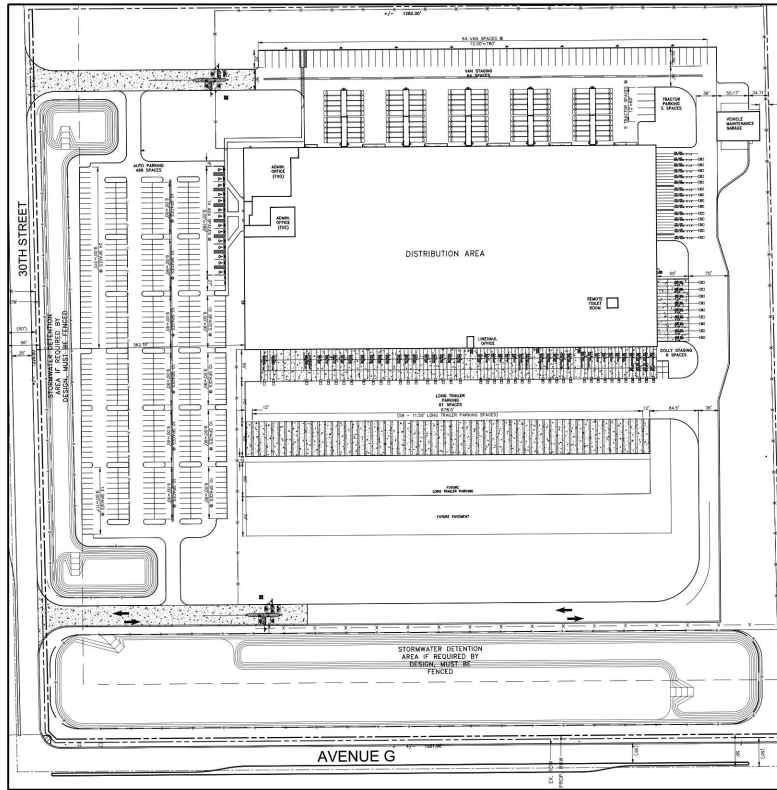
Site Plan – Proposed FedEx Distribution Facility - Lancaster, CA
